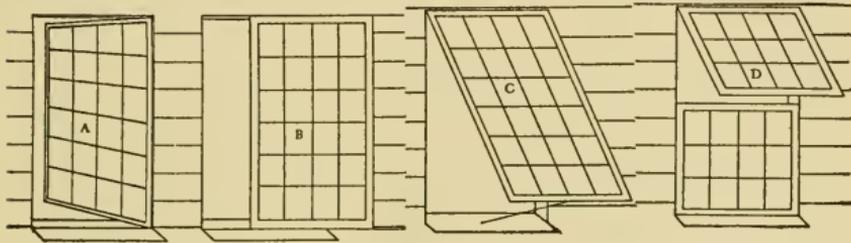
Three plans for placing openings in front wall of poultry houses.
